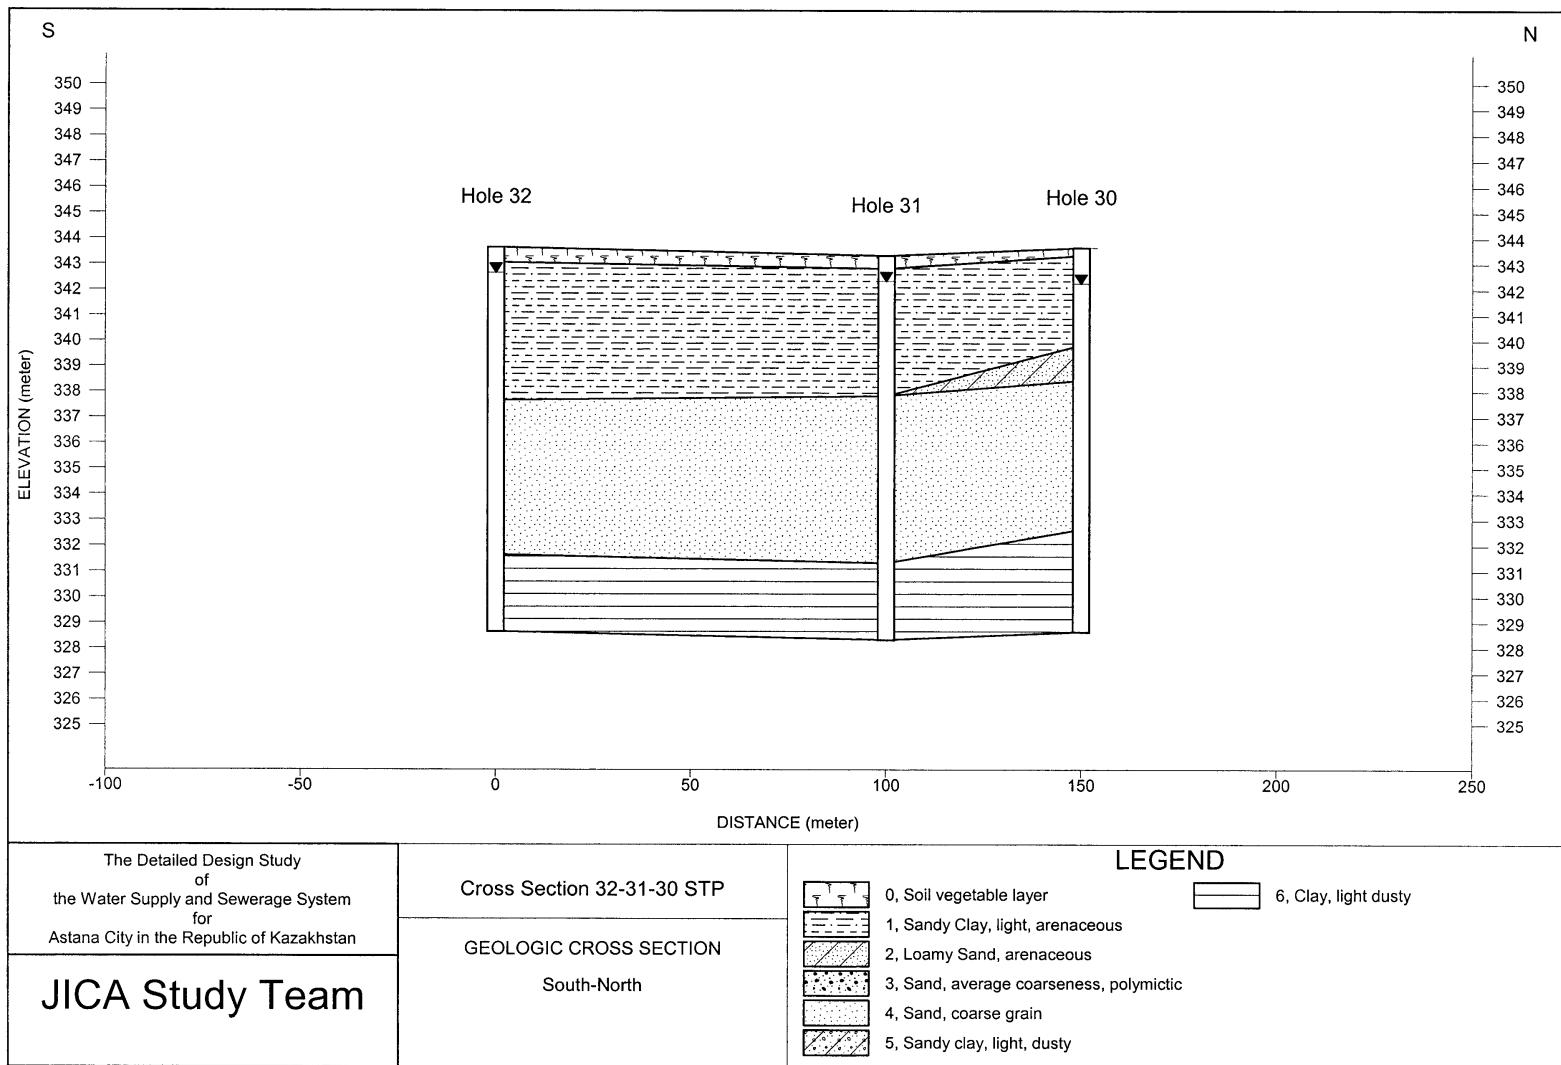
(9) Geological Cross Section at Sewerage Treatment Plant (9/9, Line No. 32-31-30)
